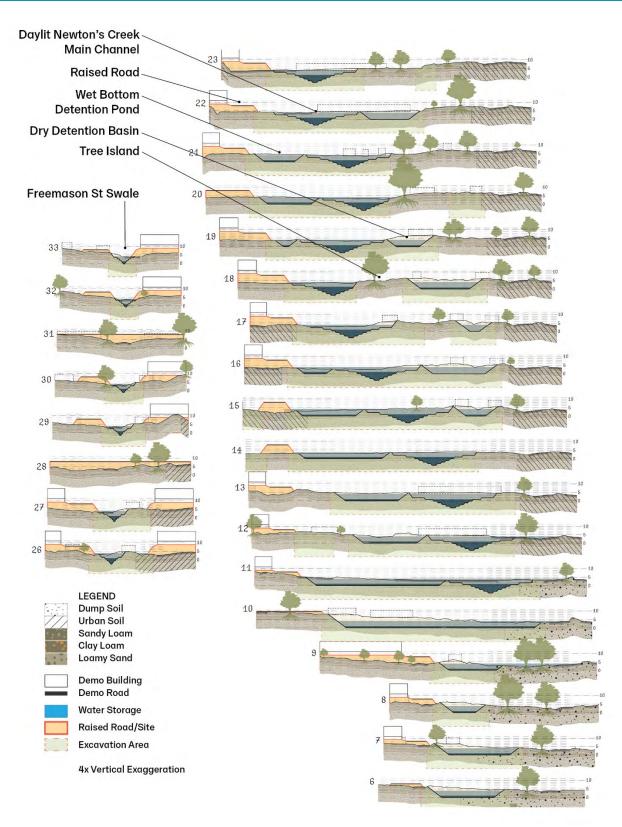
Concept landscape sections, 4x vertical exaggeration
